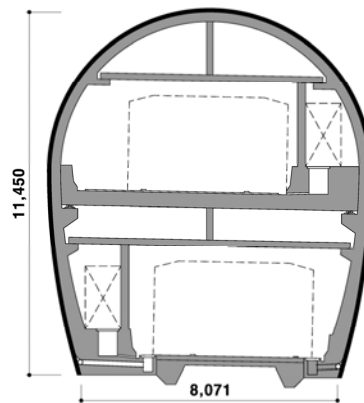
Tunnel cross sectionFig. 3. Junction cross section
